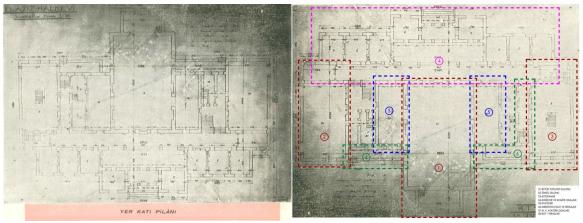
Ground floor plan of Elazığ People's House [18] Figure 12. Units on the ground floor of Elazığ People's House [18]
